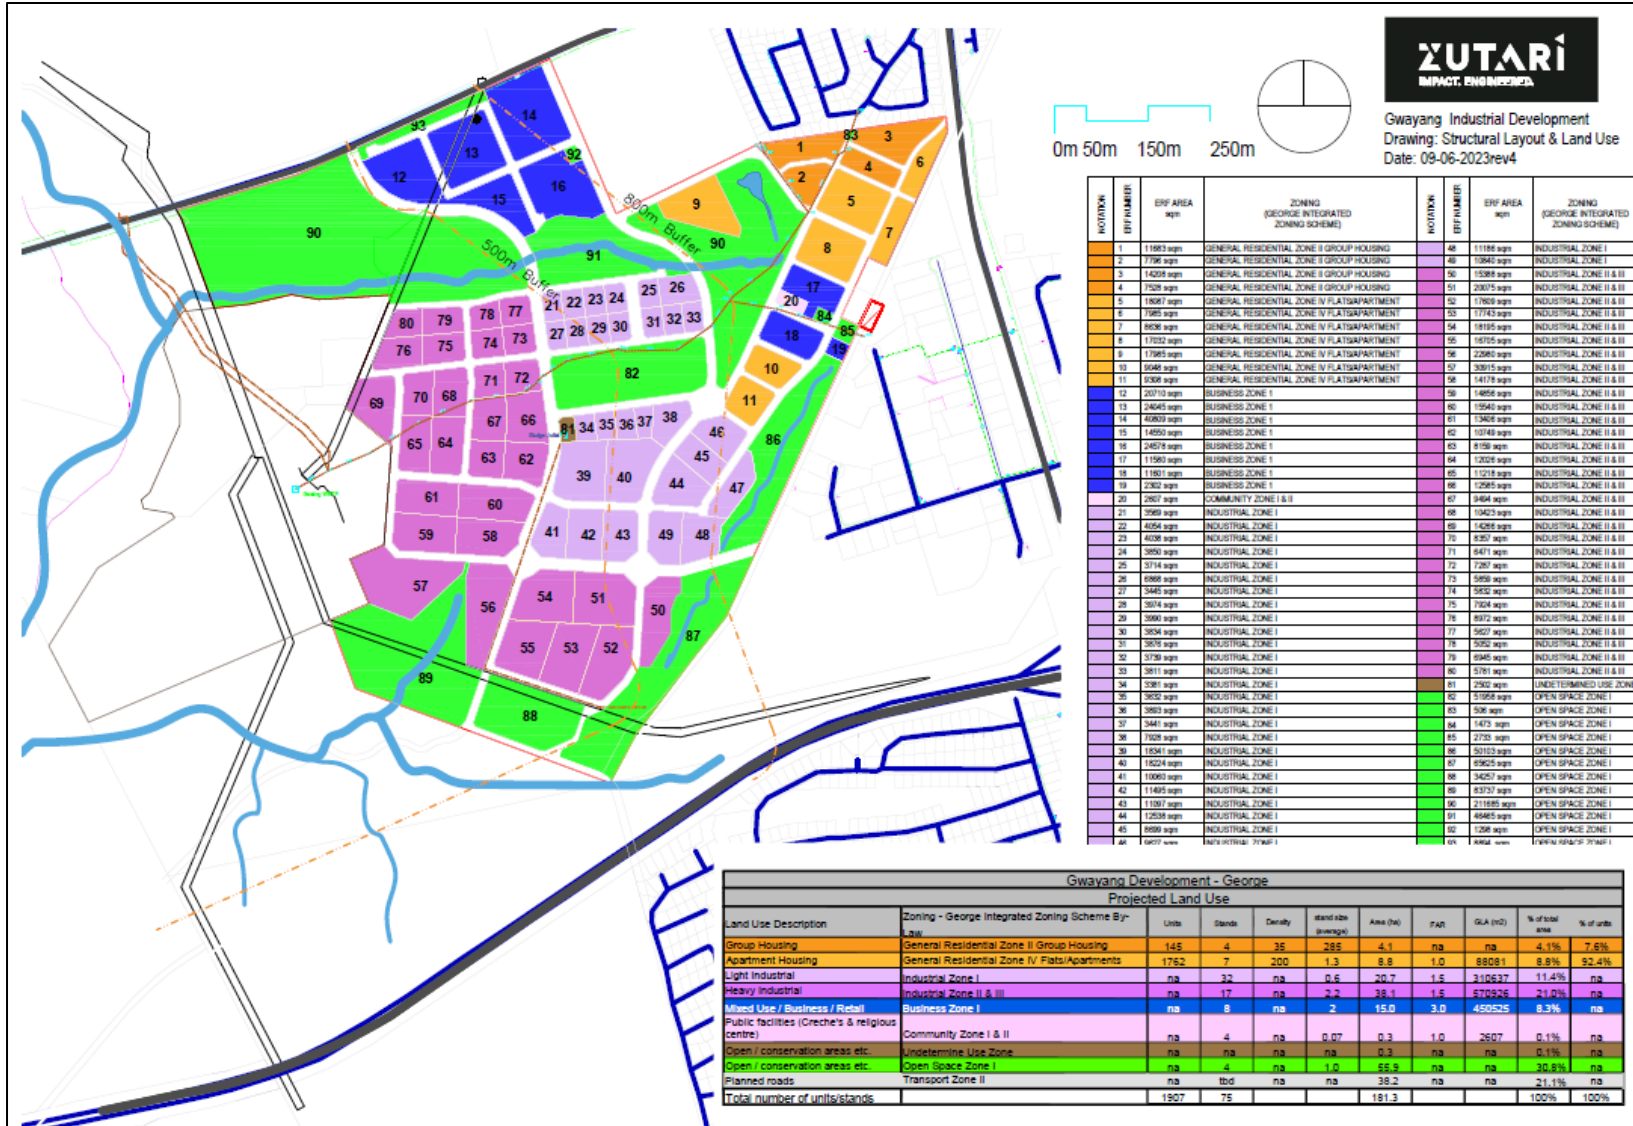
Proposed Alternative 2 concept layout plan provided by George Local Municipality.
